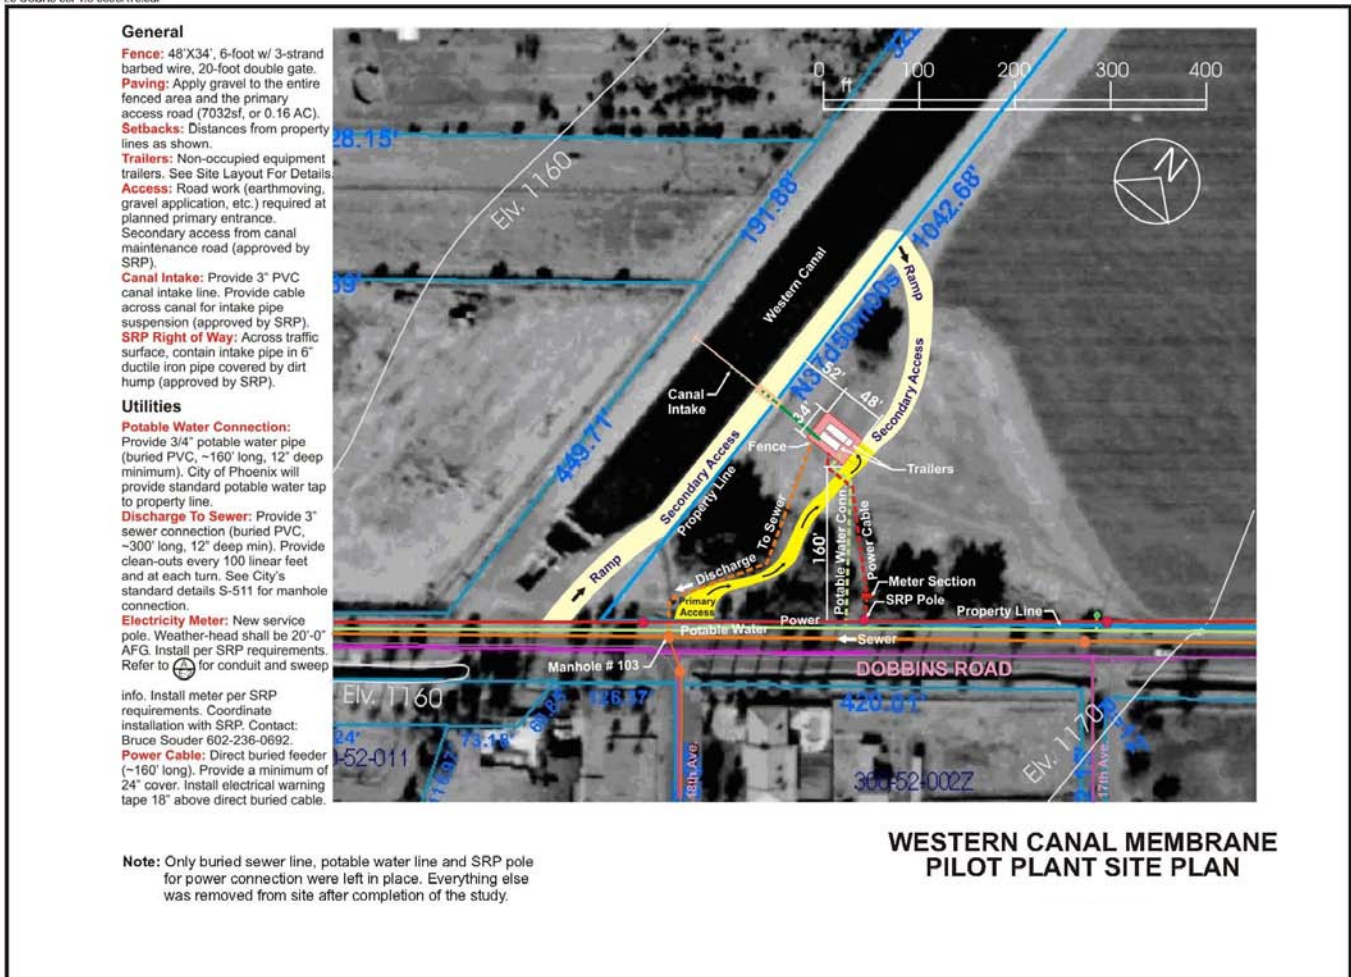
Western Canal Membrane Pilot Plant Site Plan.
